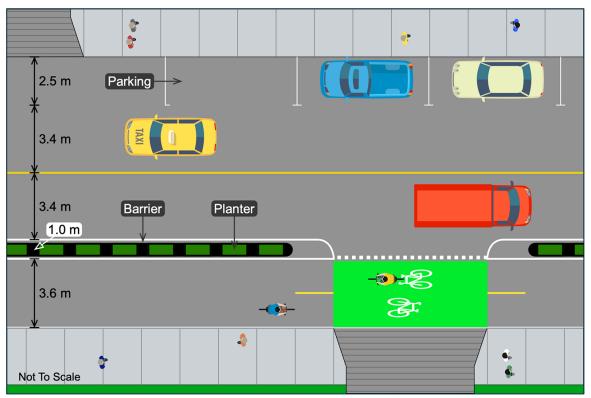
Wallace Street protected bicycle lanes, typical cross-section north of Fitzwilliam
